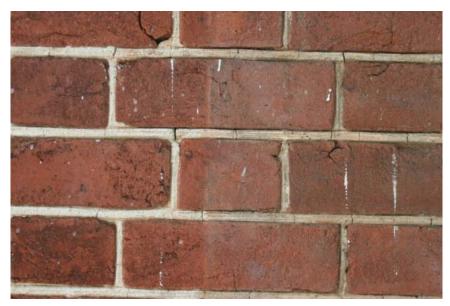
Pavilion X west elevation. Detail of oil struck bricks laid in Flemish bond. Colorwash and penciling still survives in sheltered areas of this elevation.
